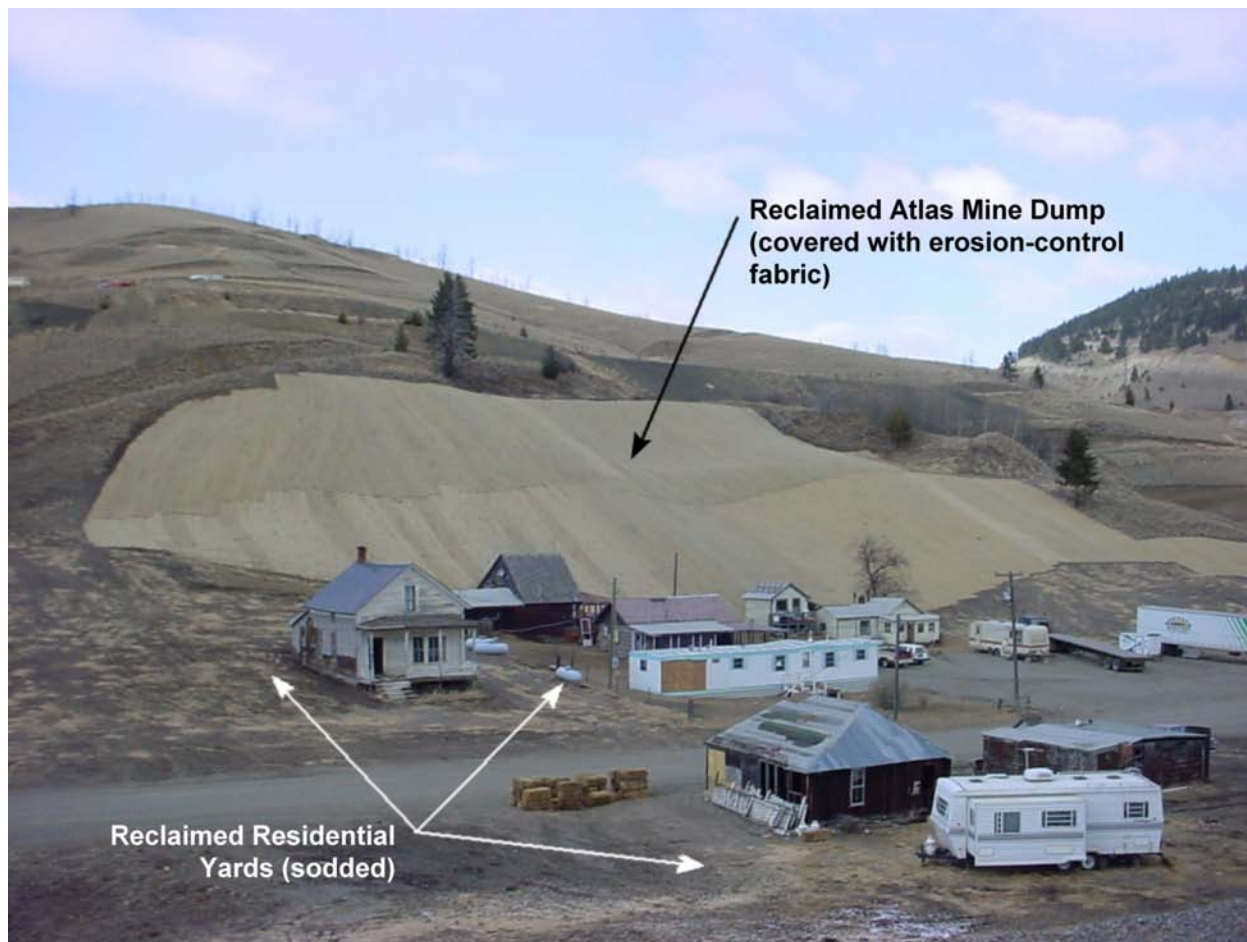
Reclaimed Residential Area at Wickes Smelter Site
